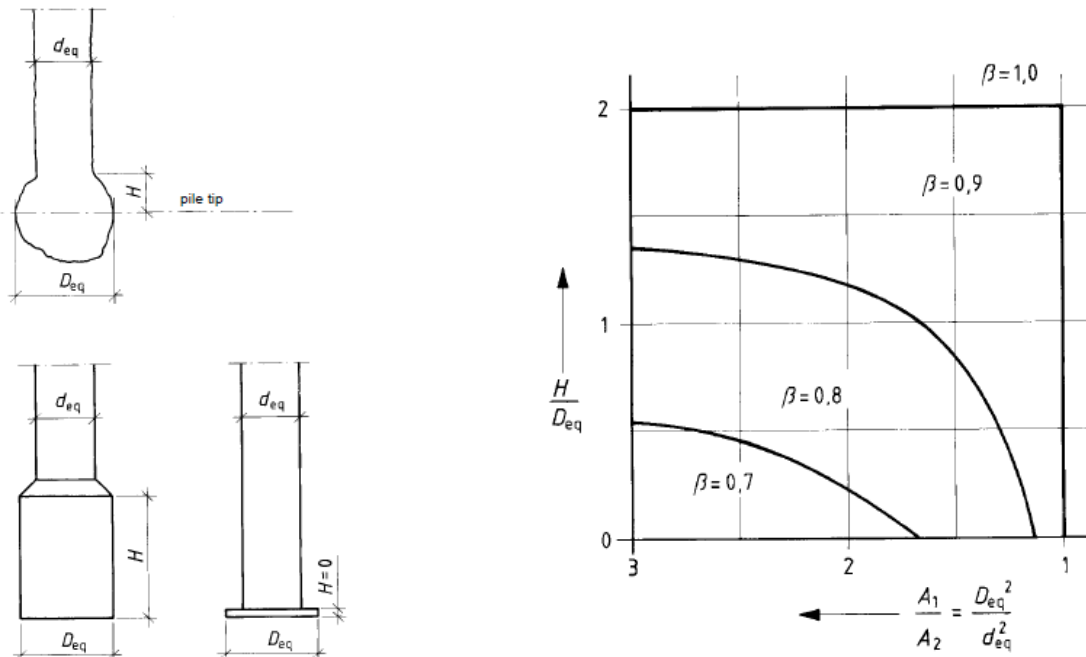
Left; Shape of the pile footing. Right; Factor for the shape of the pile footing,  $\beta$
